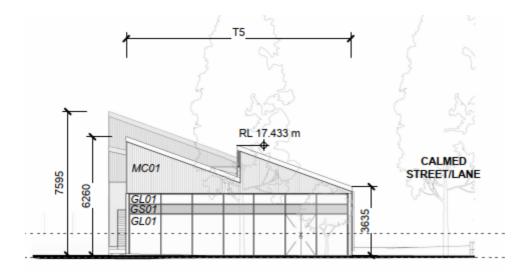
East elevation Industry tenancy 1 in north east corner, Source: NE Plot Proposed Elevations and Materials TP111 Rev A by *Six Degrees Pty Ltd
